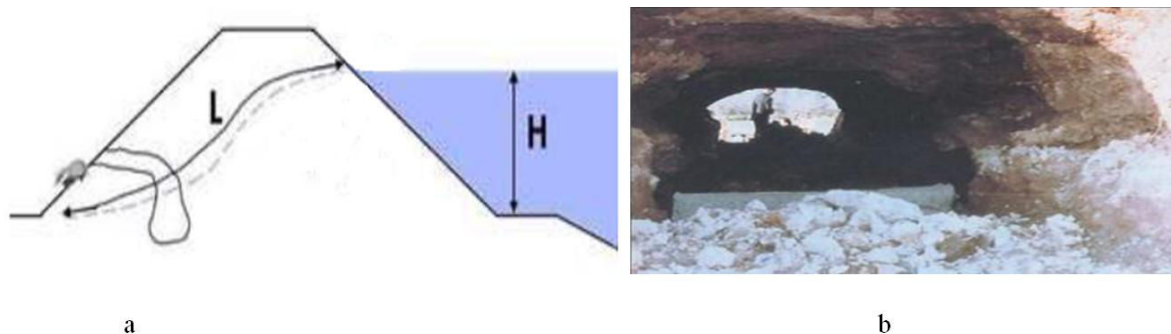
a-Phenomenon of piping (Pham 2008); b-hydraulic piping in earth dam (Lautrin 2002).
